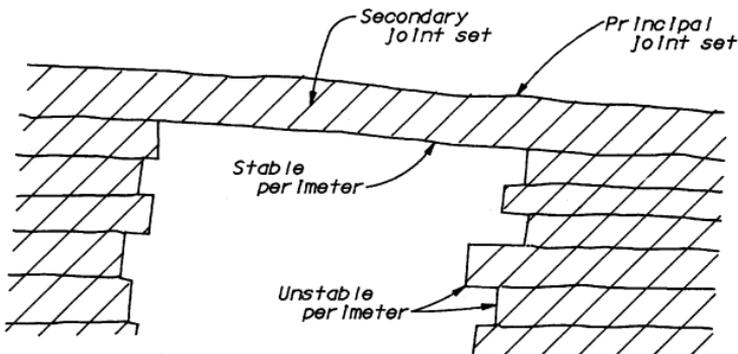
Effect of jointing on the stability of an excavation (plan view).
